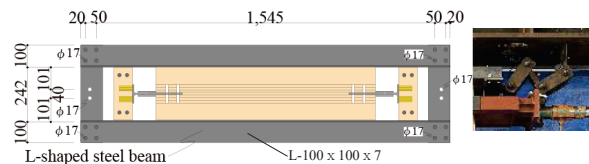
L-shaped steel beams for out-of-plane deformation prevention
